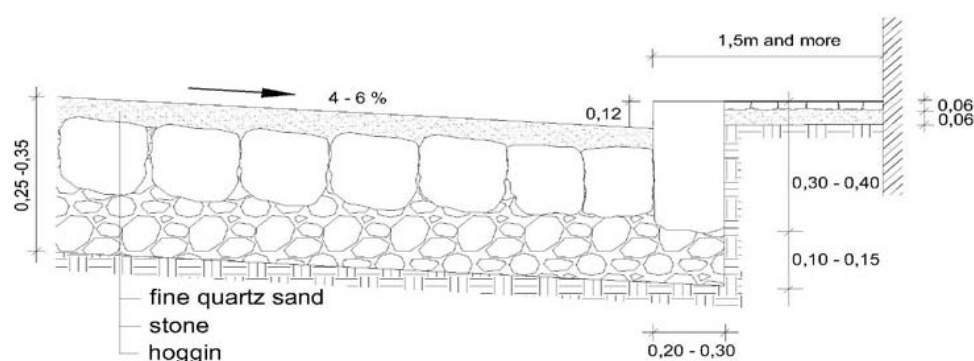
Construction and constructive elements of the Turkish cobblestone [2]
